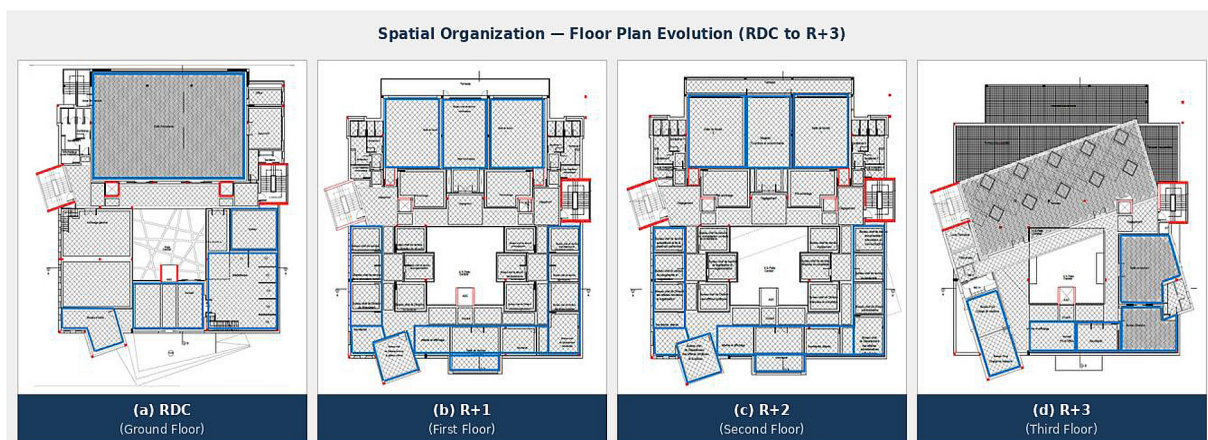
Spatial evolution of the AUKSS building across floor levels: (a) ground floor – RDC, (b) first floor — R+1, (c) second floor — R+2, (d) Third floor — R+3. Floor plans reconstructed in AutoCAD from architectural drawings
